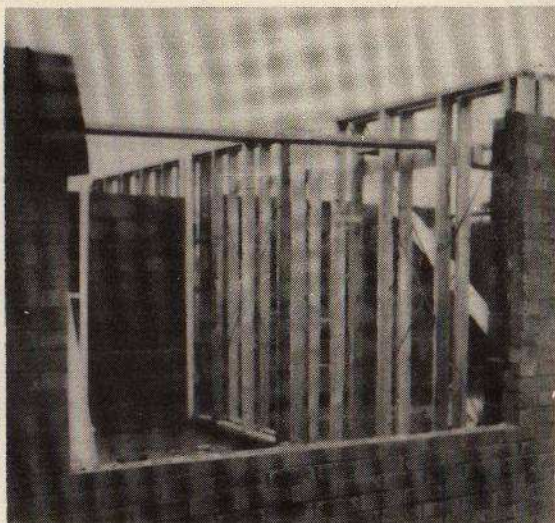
TYPICAL JUNCTION DETAILS REFERRED BACK TO FIGURE 4
